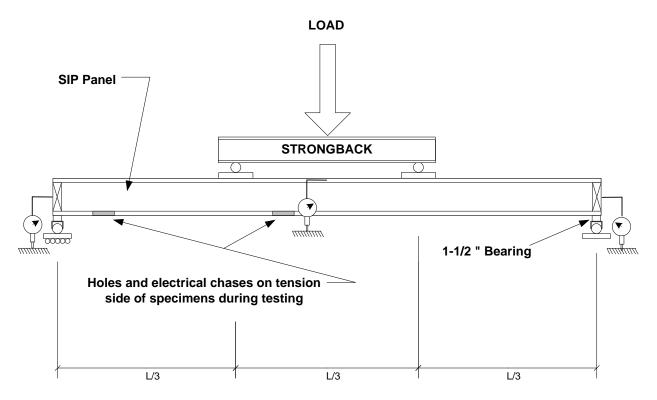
TRANSVERSE LOAD TEST SPECIMENS
